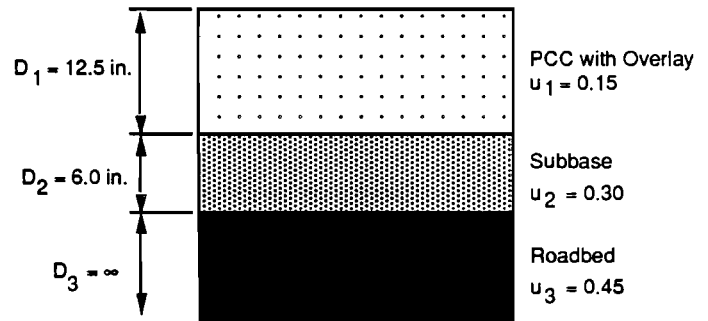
Pavement structure used for back calculations in RPEDD1.
